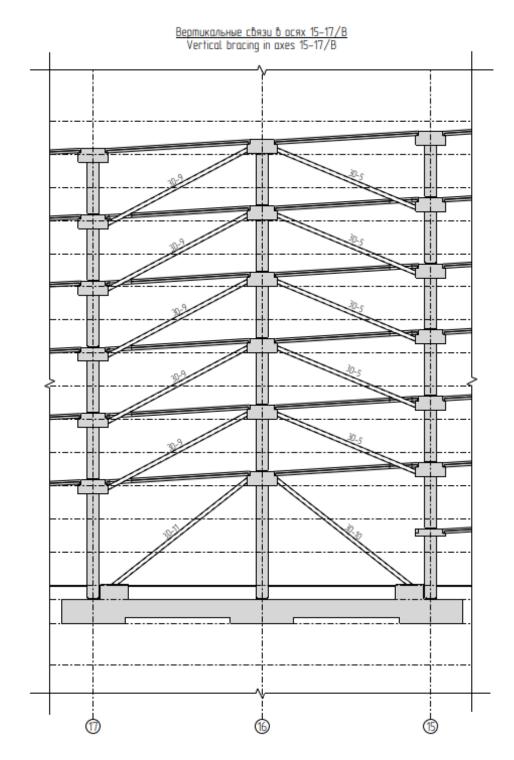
Extract from the layout drawing of steel brace support structure (Retrieved by KZh). Main view
